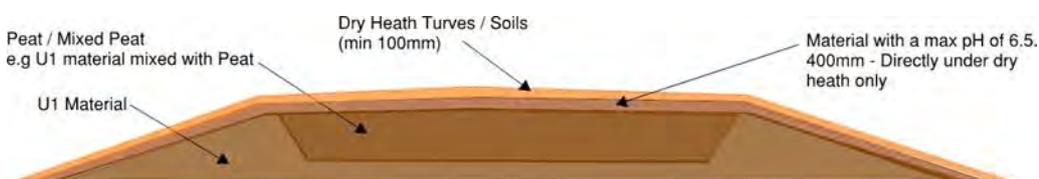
Example illustration of a typical cross section of MDA with Dry Heath
